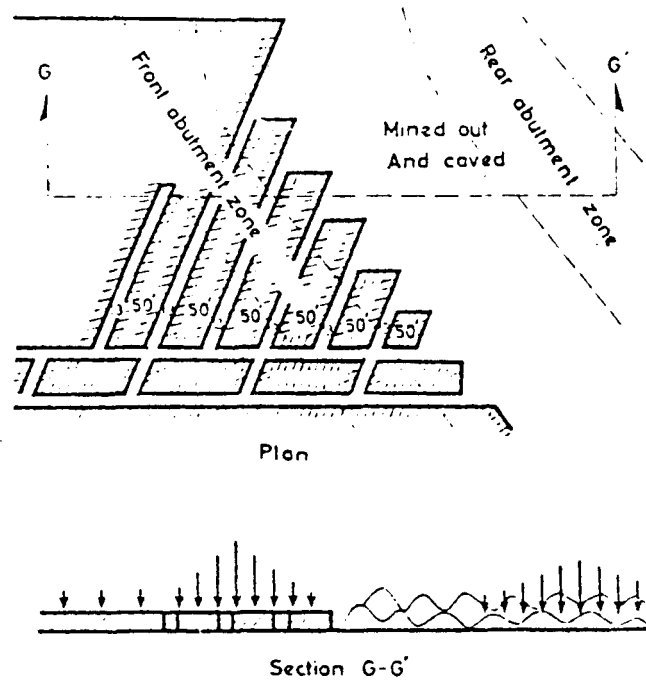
Pillars are too wide to yield and too much area has been developed. The front abutment will damage the development openings.
